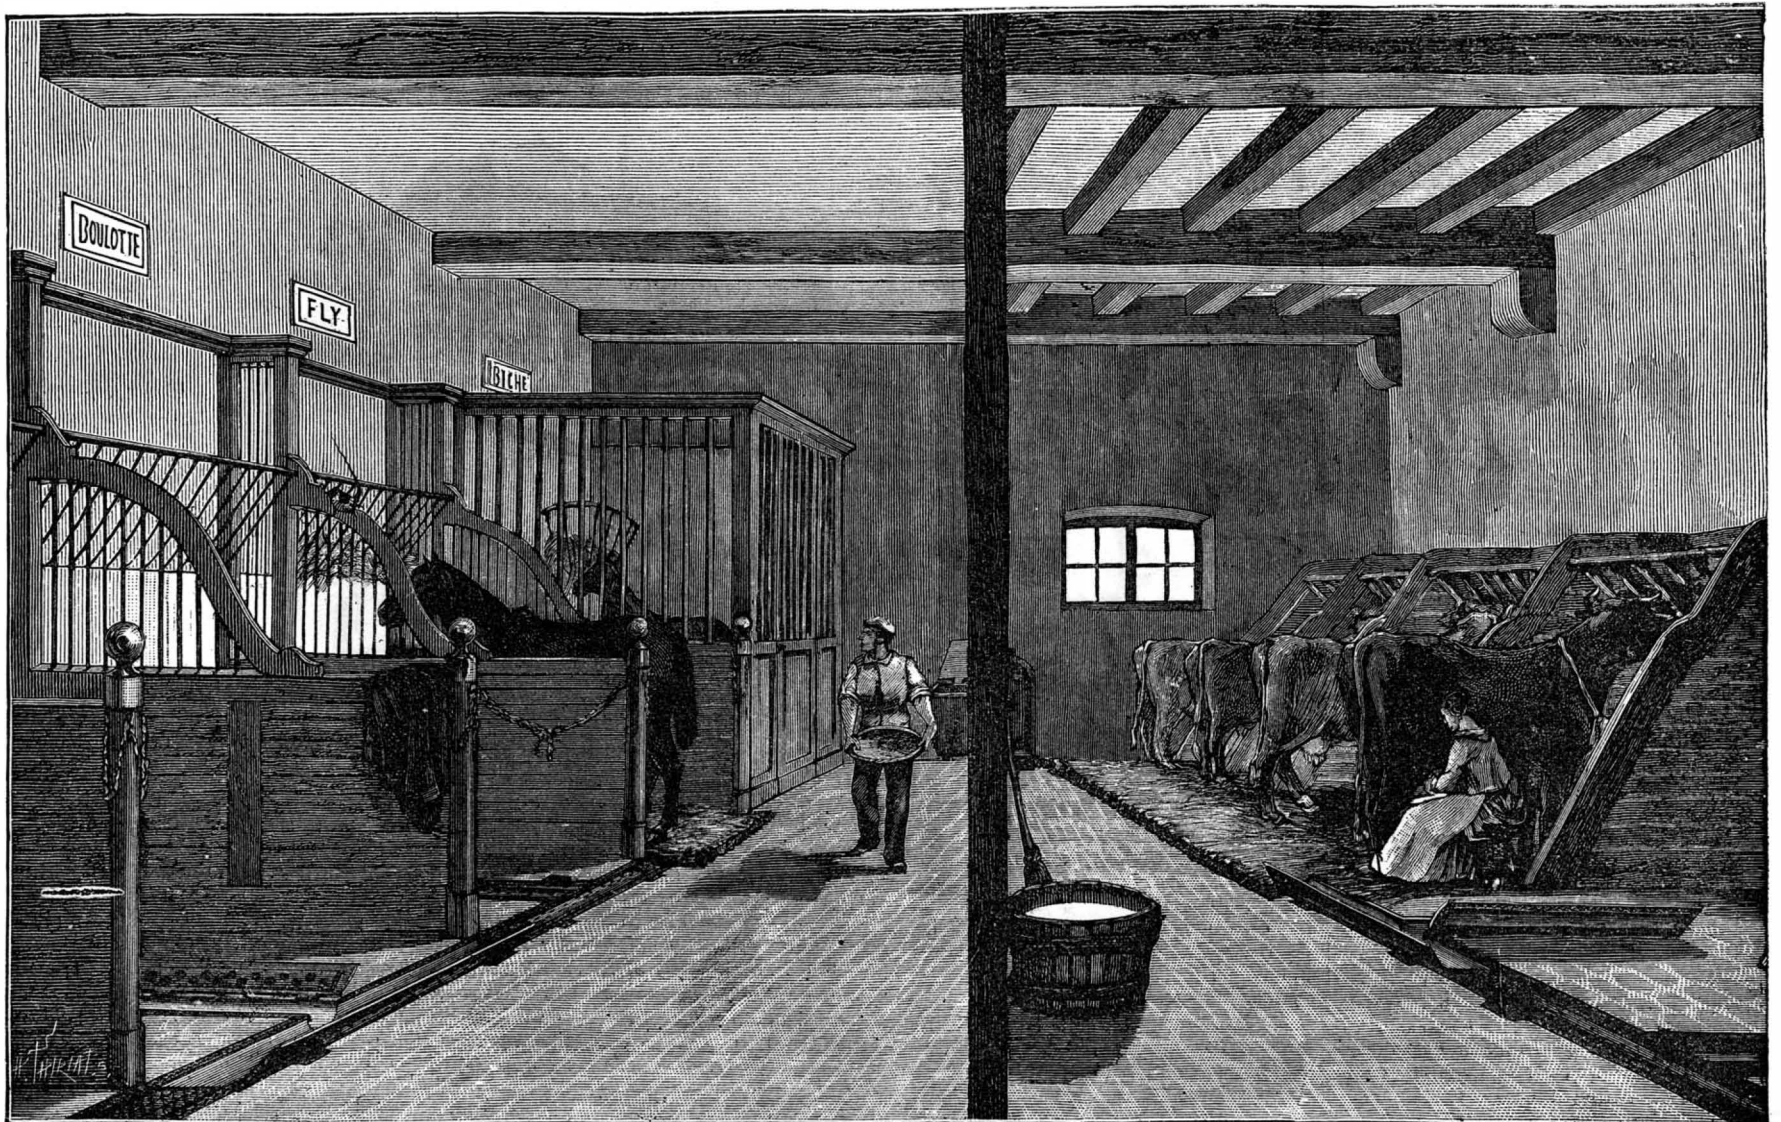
STABLE WITH HORIZONTAL FLOORS AND HYGIENIC DRAINAGE.
